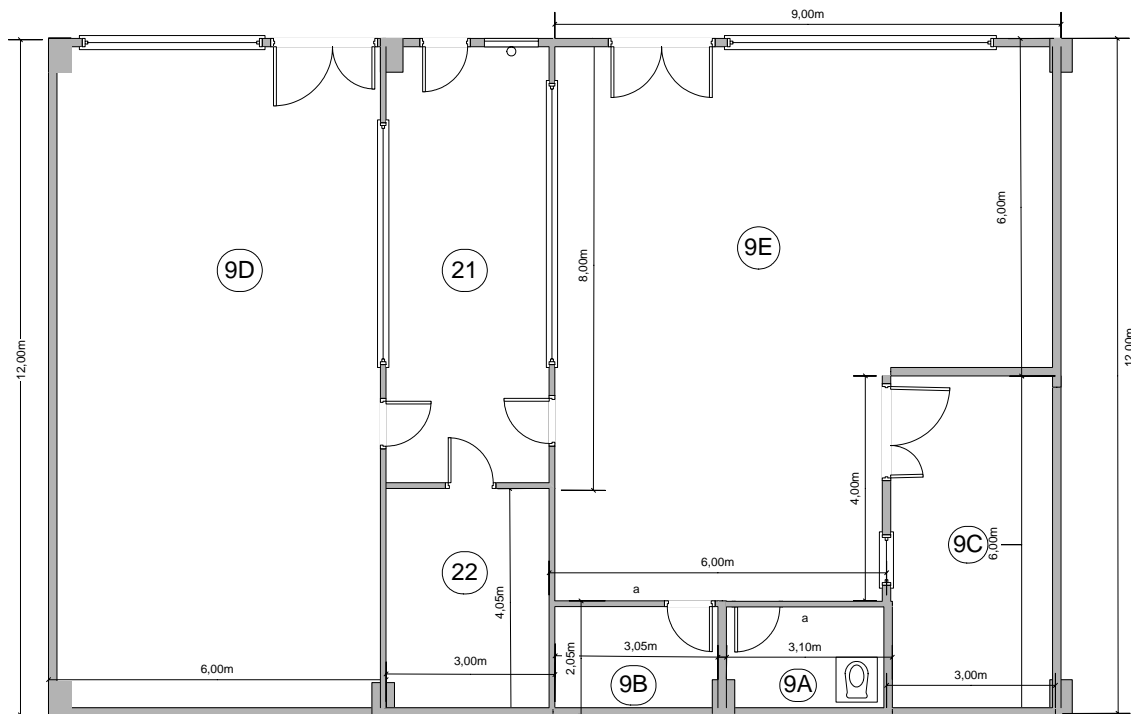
General layout of the new MELISSA Pilot Plant laboratory.
